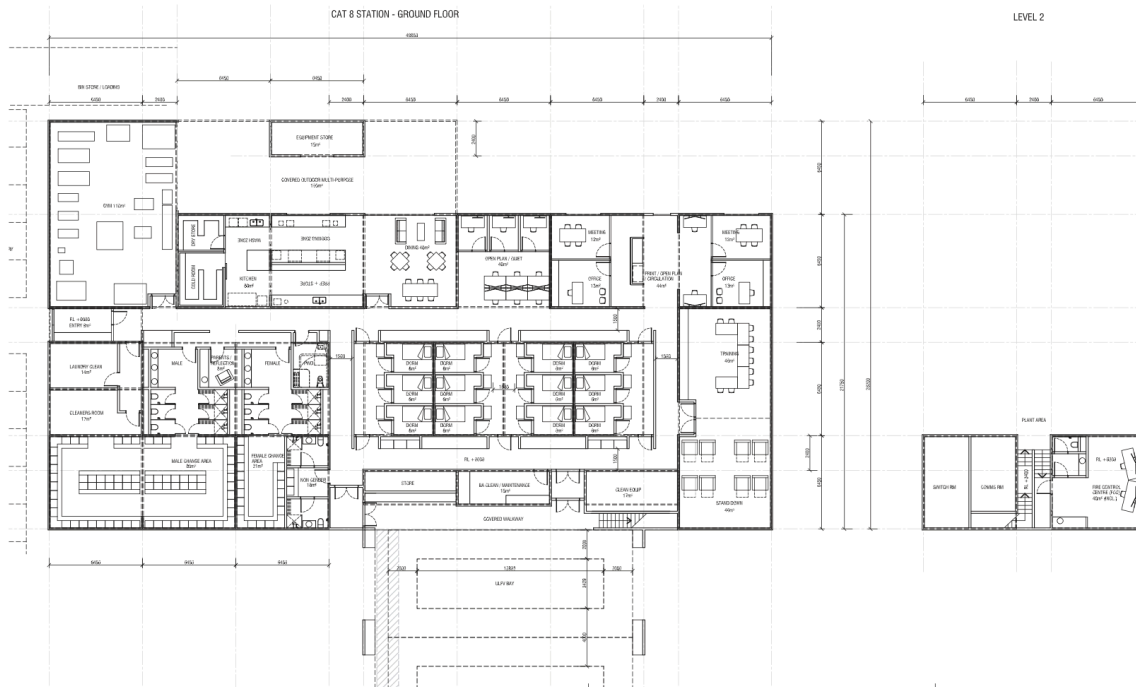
Cat 8 Station – Single level 'dirty' zone floor plan
